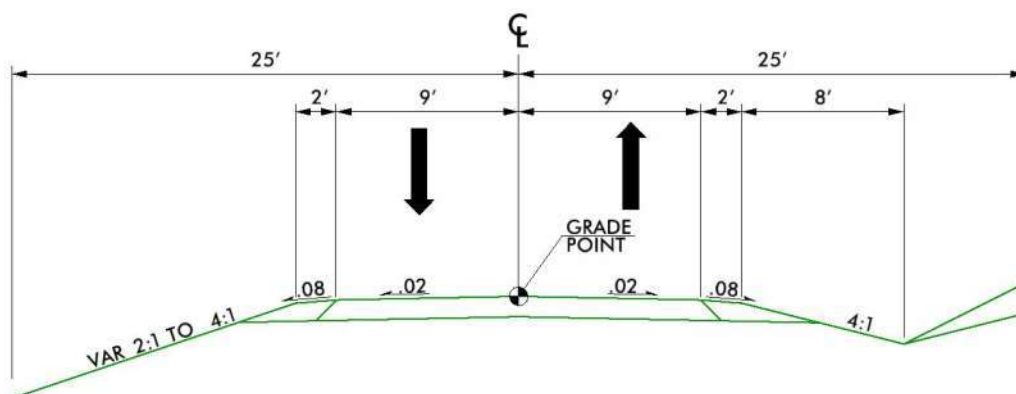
LOCAL ROAD TYPICAL SECTION
